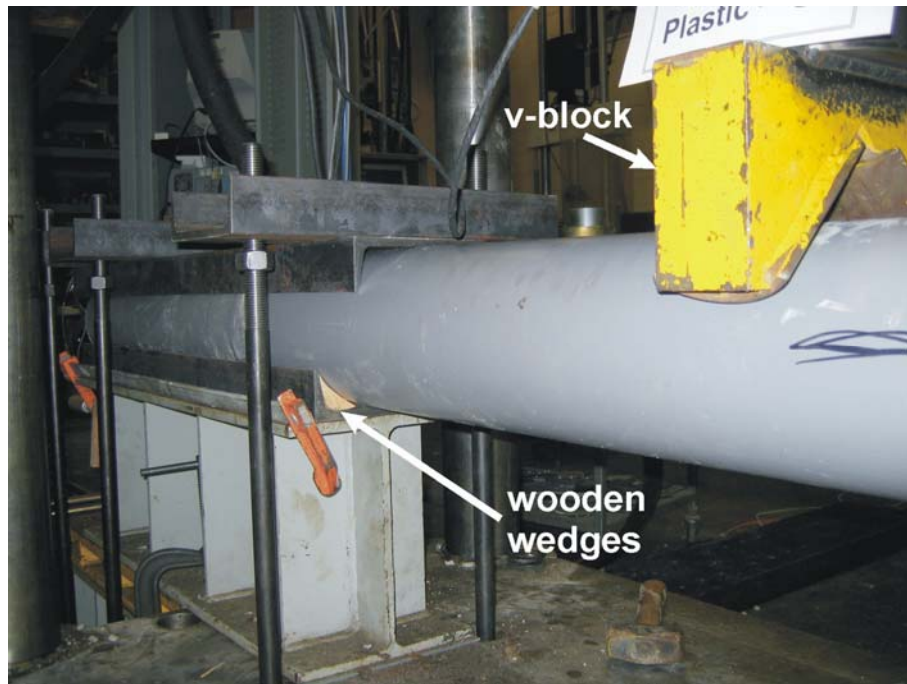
Bollard Testing Configuration – Support and Loading Details
